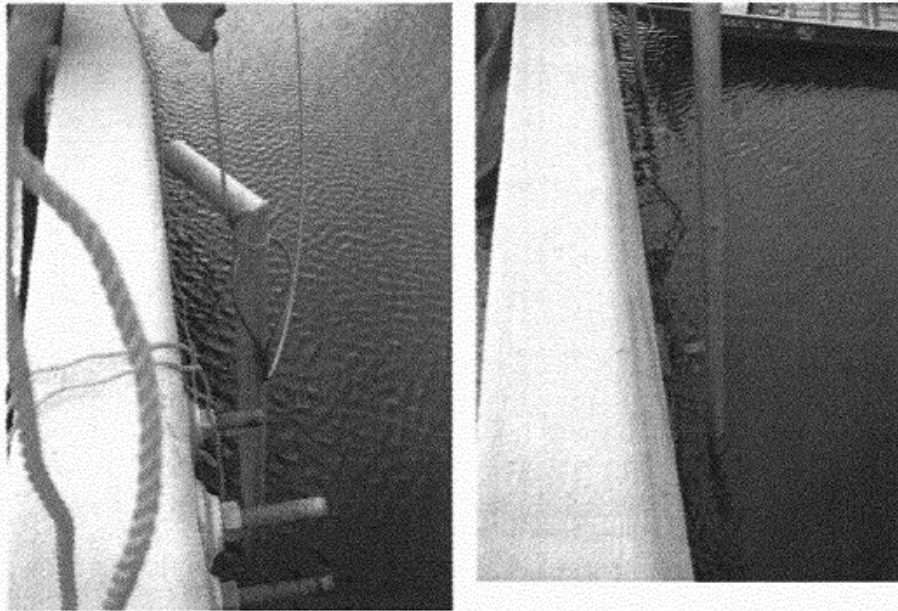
CS-29 Black Bayou Culverts - West Side
